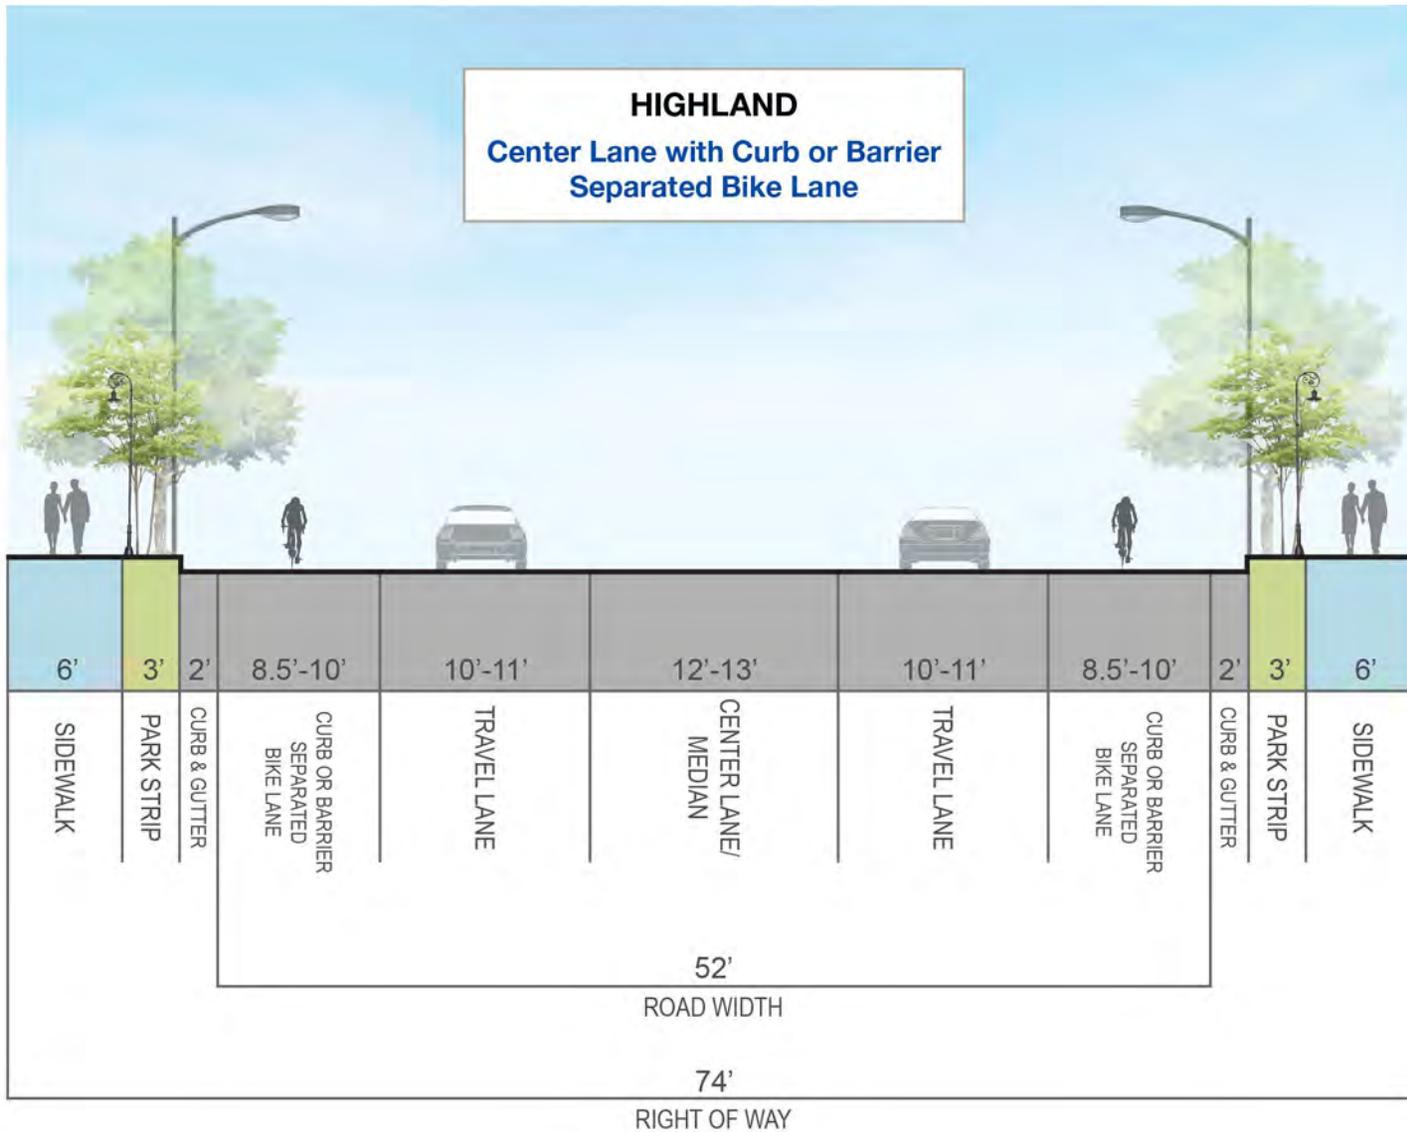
Center Lane with Curb or Barrier Separated Bike Lane
